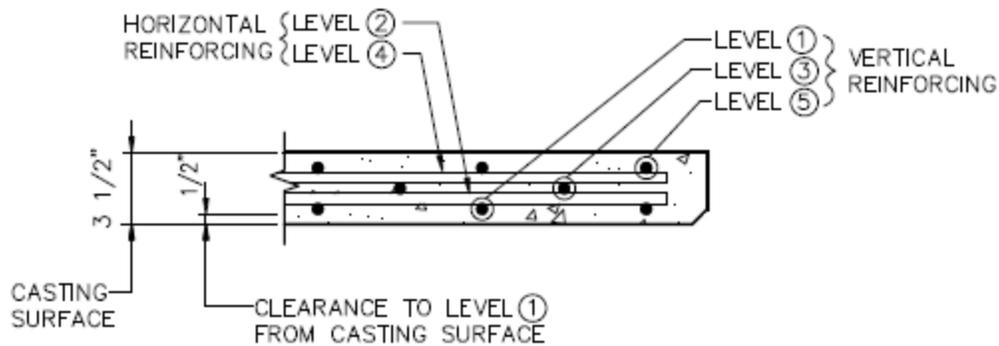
Steel reinforcement levels (Abi-Nader 2010)
